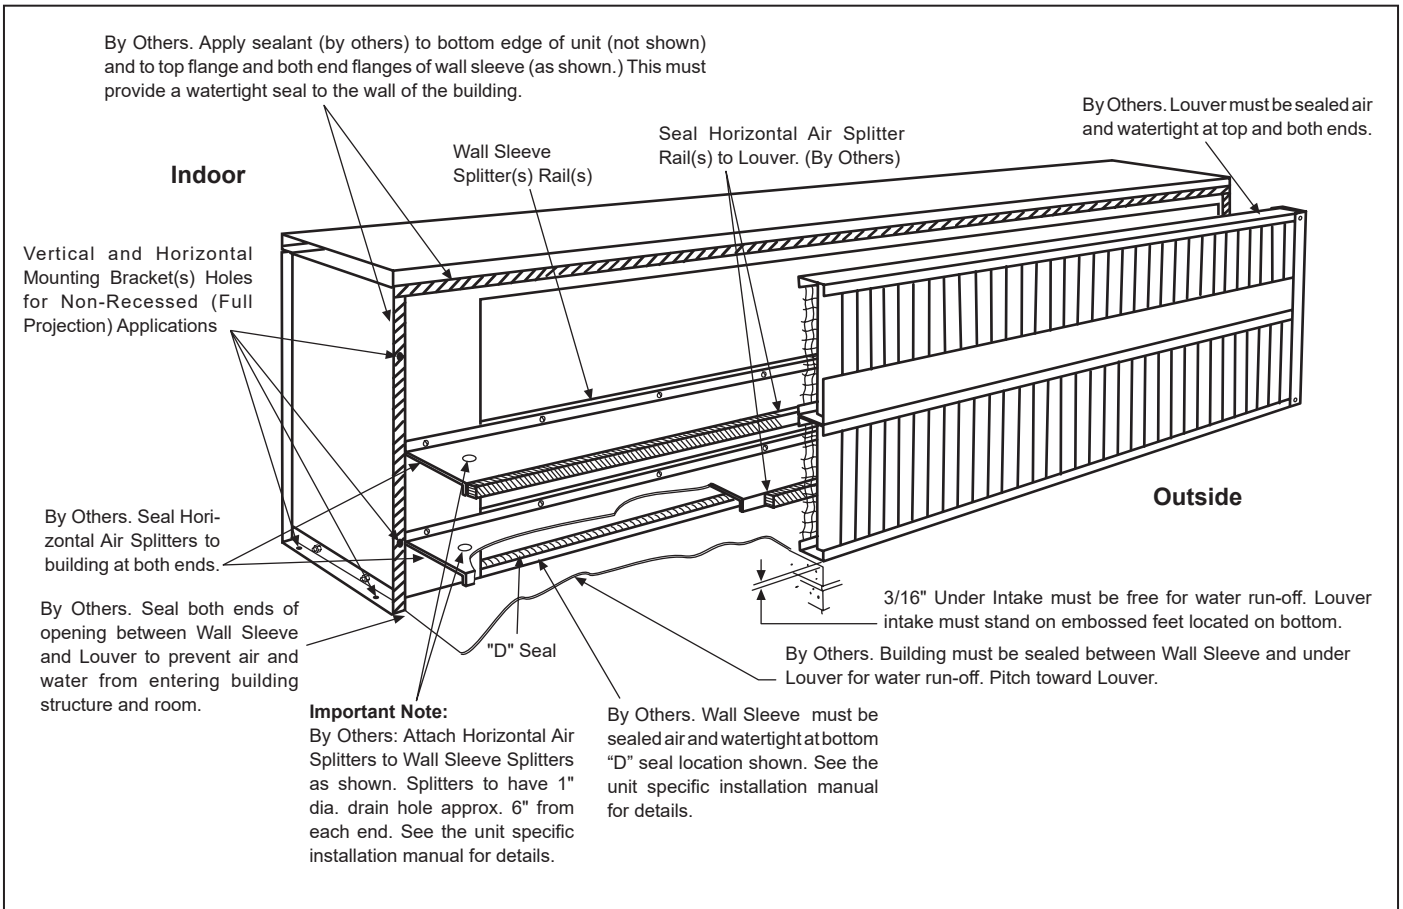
Recessed Wall Sleeve - Direct Sealing Wall Sleeve to Louver
